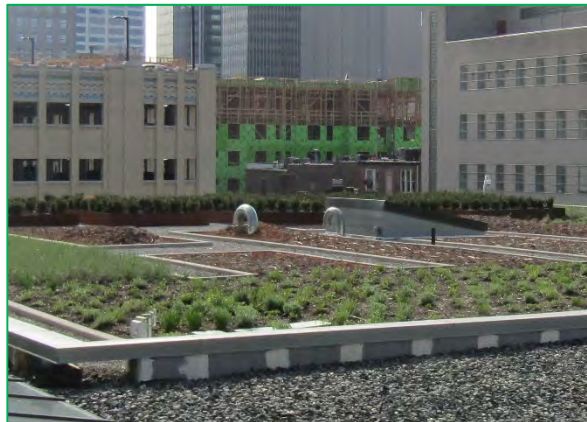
TYPICAL GREEN ROOF INSTALLATION
